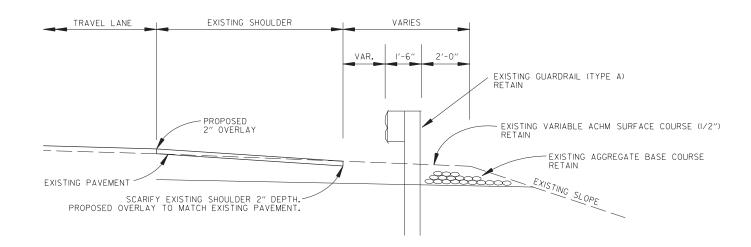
DETAIL FOR PAVEMENT TRANSITIONS AT BRIDGE LOCATIONS
